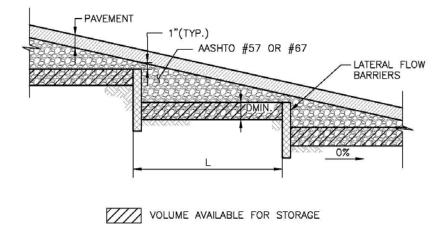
Permeable Pavement Profile, Stepped Installation
